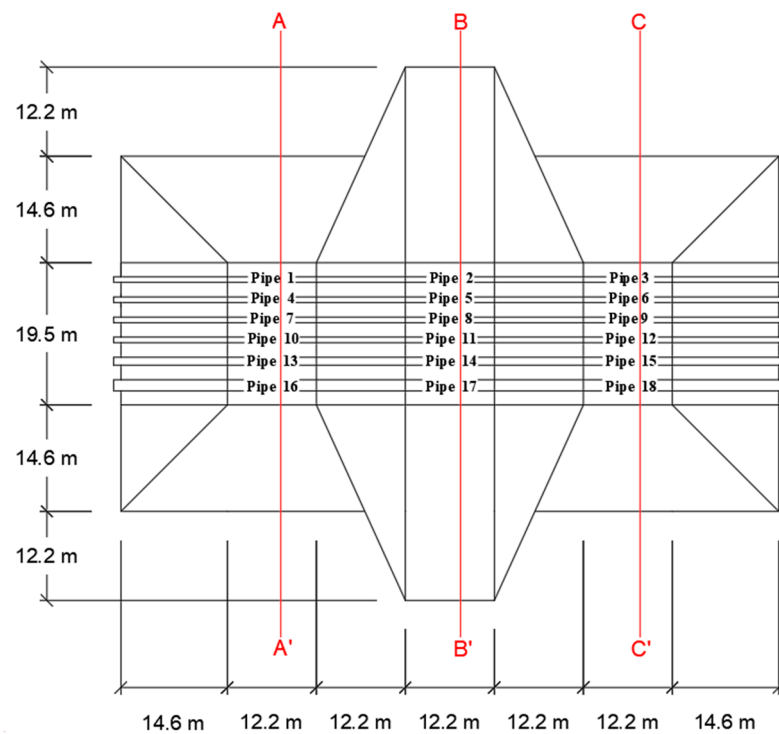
The embankment construction plan and the positions of the pipes in the embankment.
